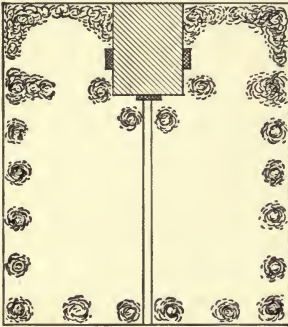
A Substantial Village School-house with an Abundance of Light and a Good Arrangement of Trees and Shrubs.
